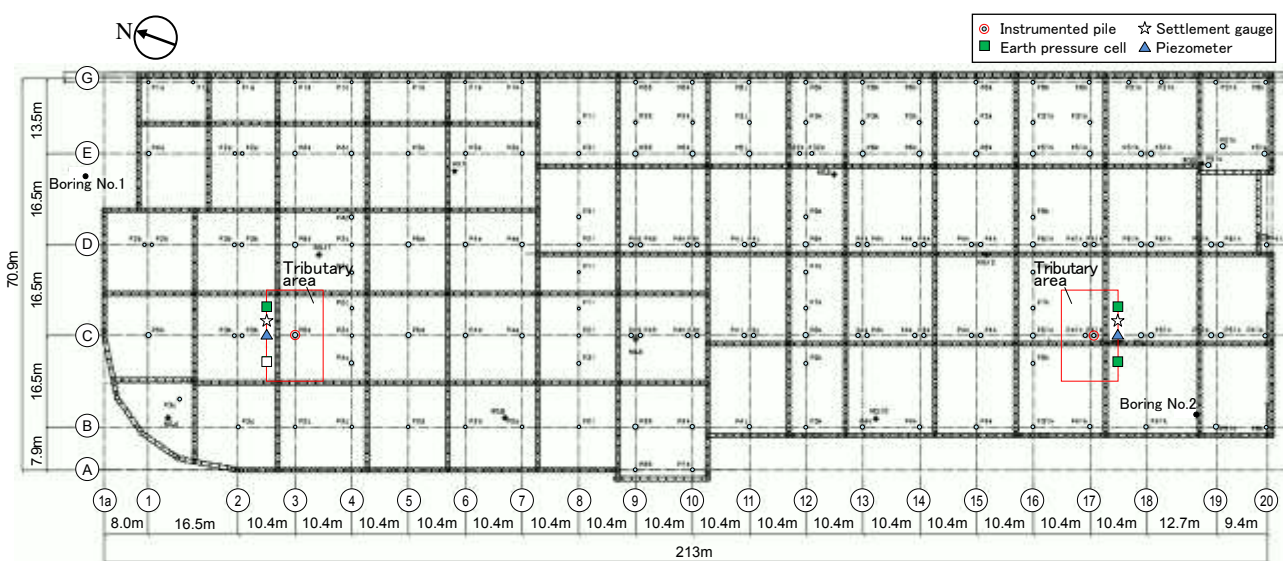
Layout of piles and grid-form DMWs with locations of monitoring devices
